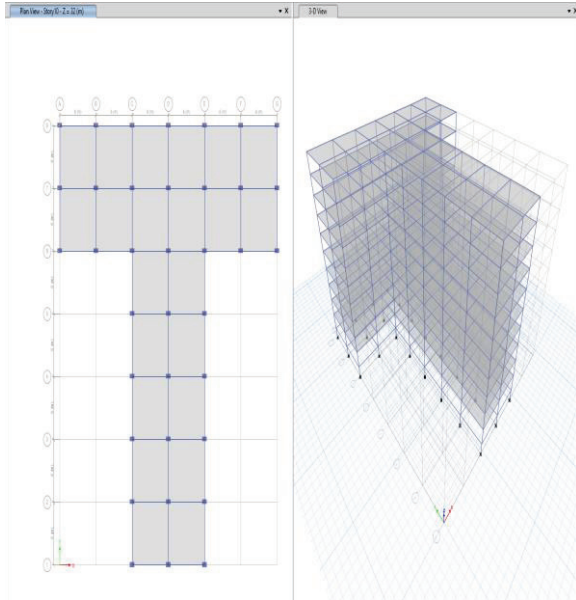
Plan and Isometric view of Model-5 with LRB G+10
